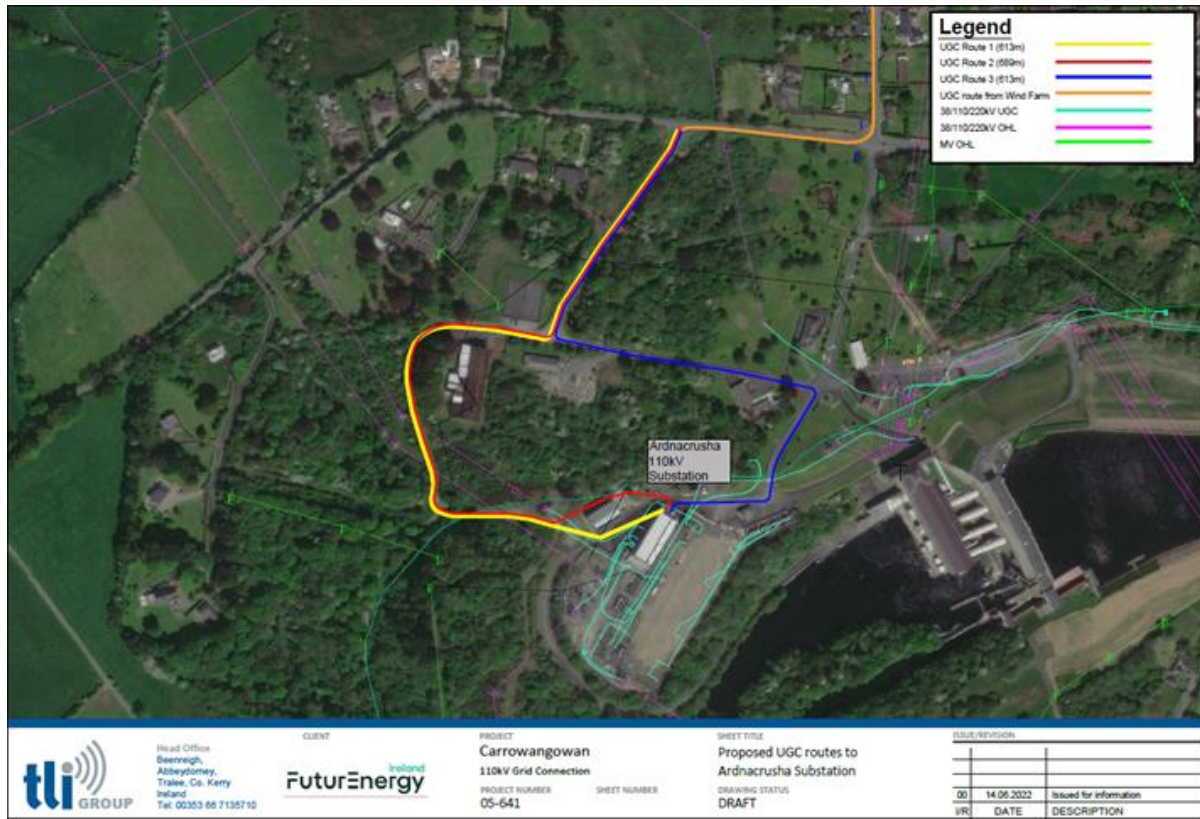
Alternative Designs Considered for connection into Ardnacrusha Substation
